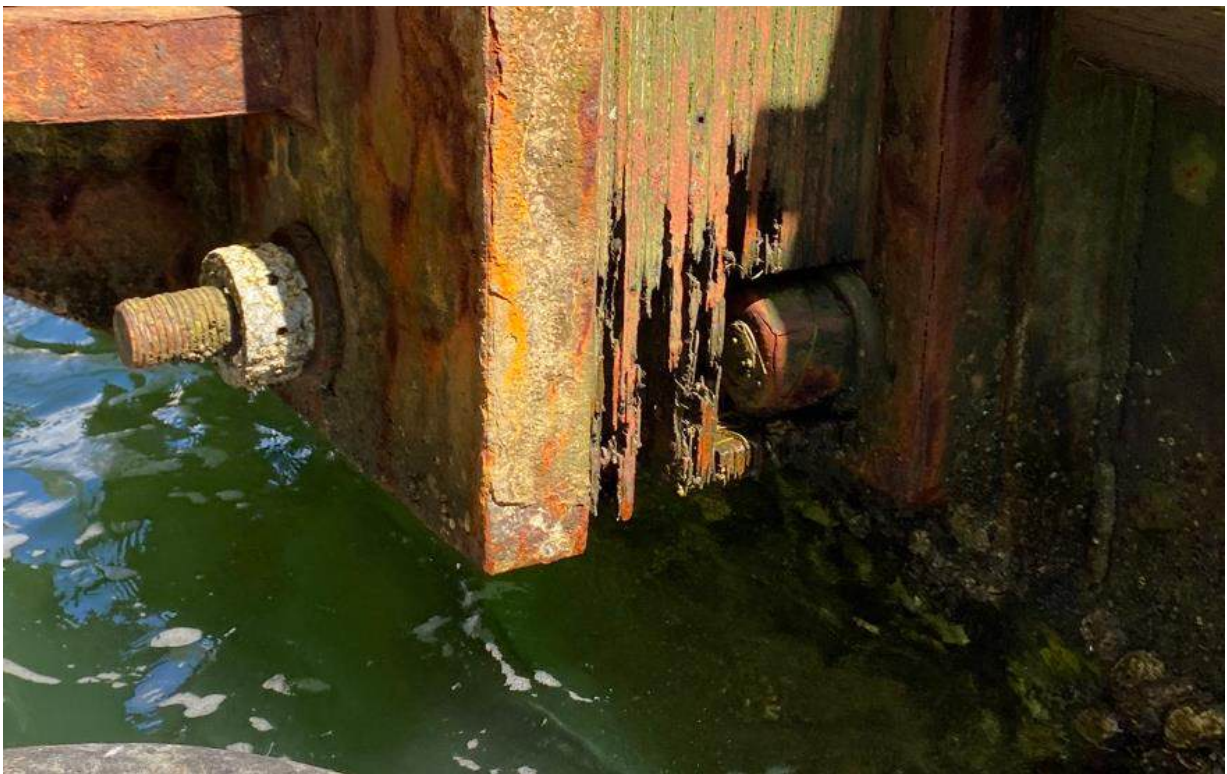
Condition of Lower Anchor Bolt, Nut, and Timber Frame 121
